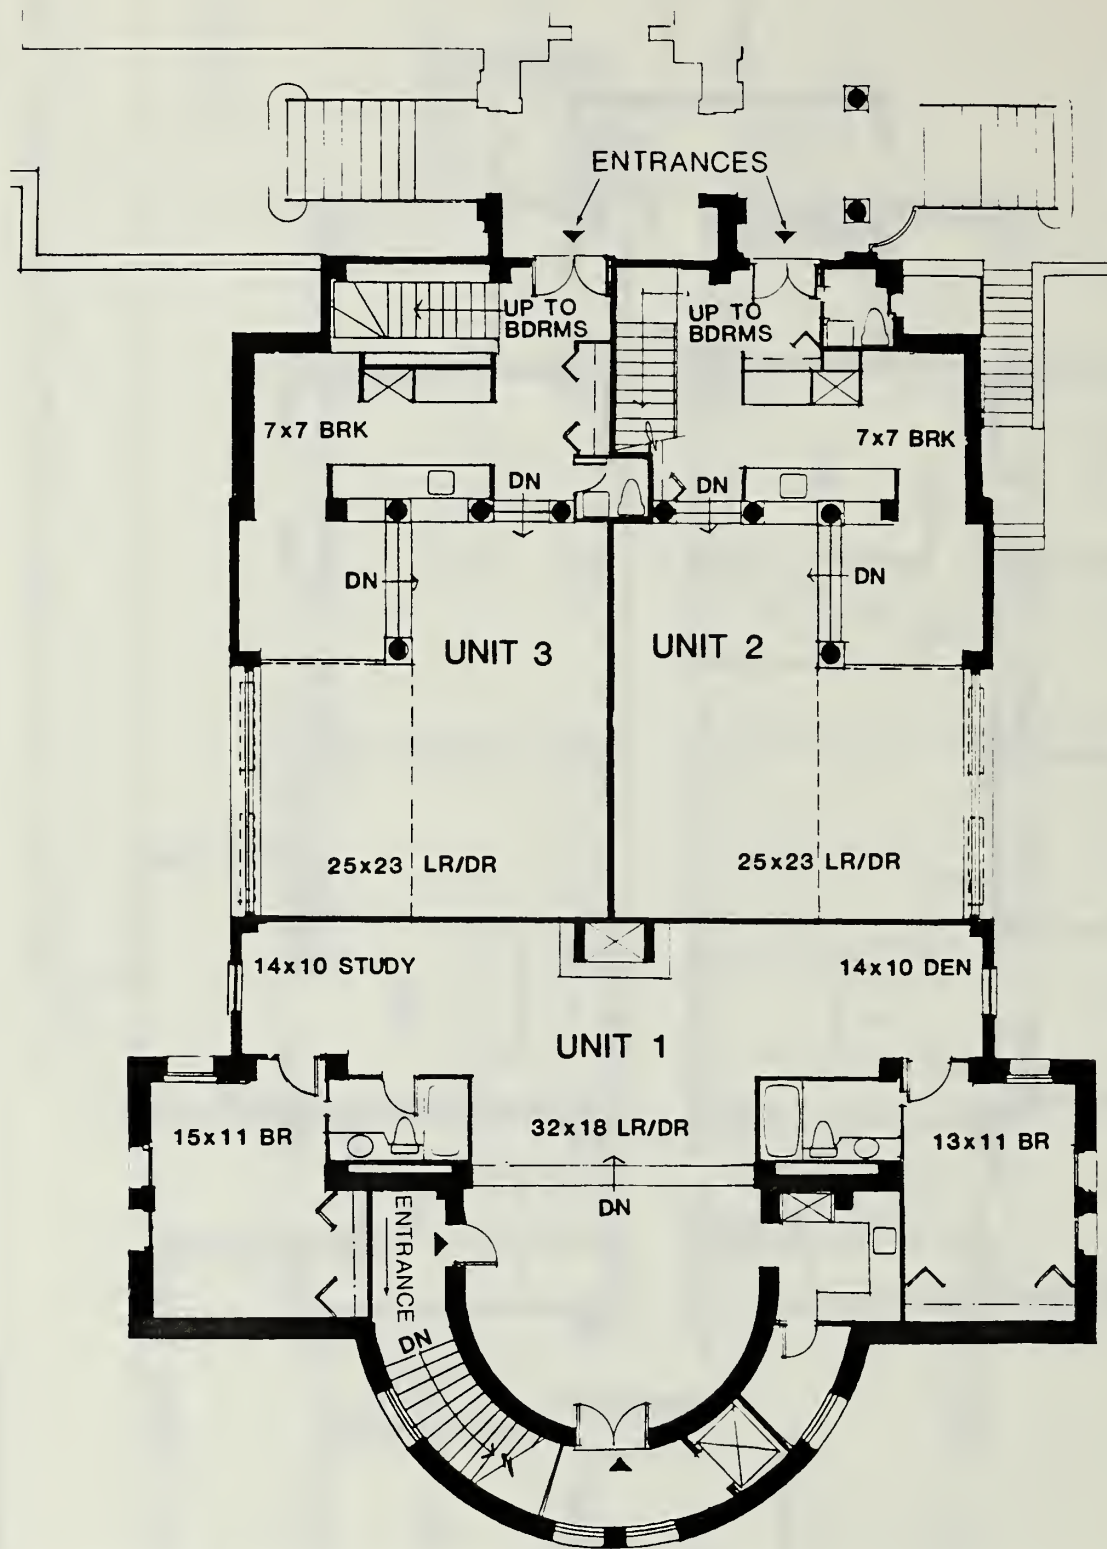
Convent Building Floor Plan (Ground Floor)
